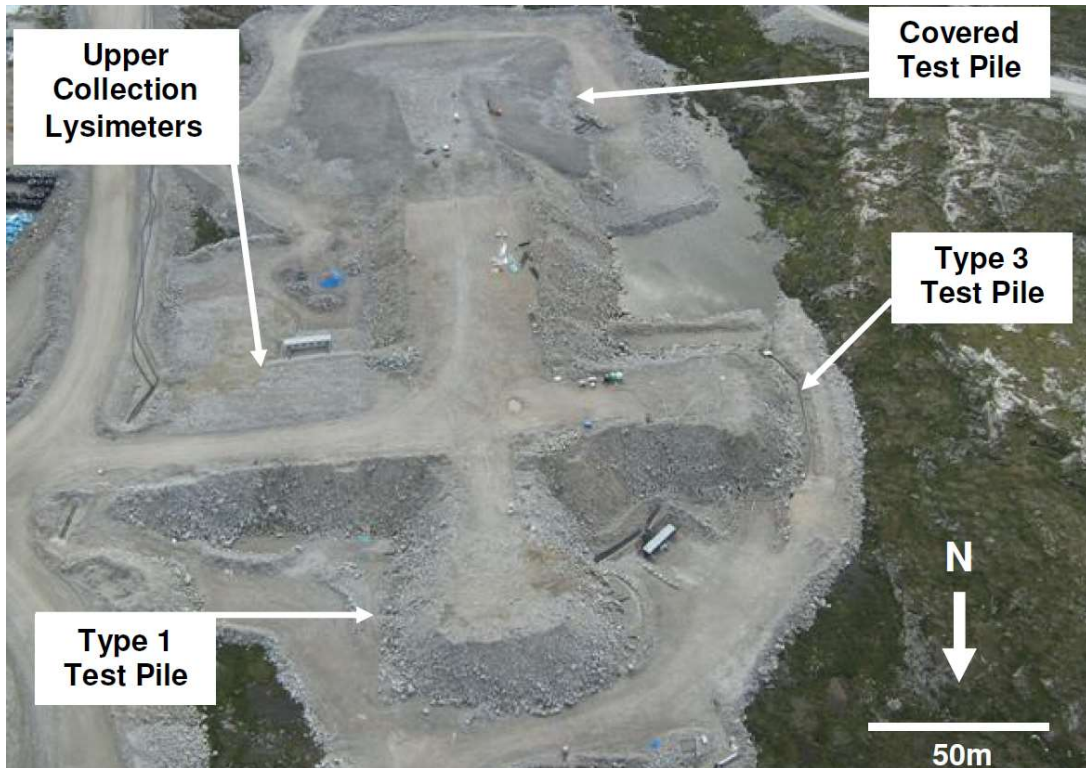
Aerial view of the Diavik test piles field site (Neuner, 2009).
